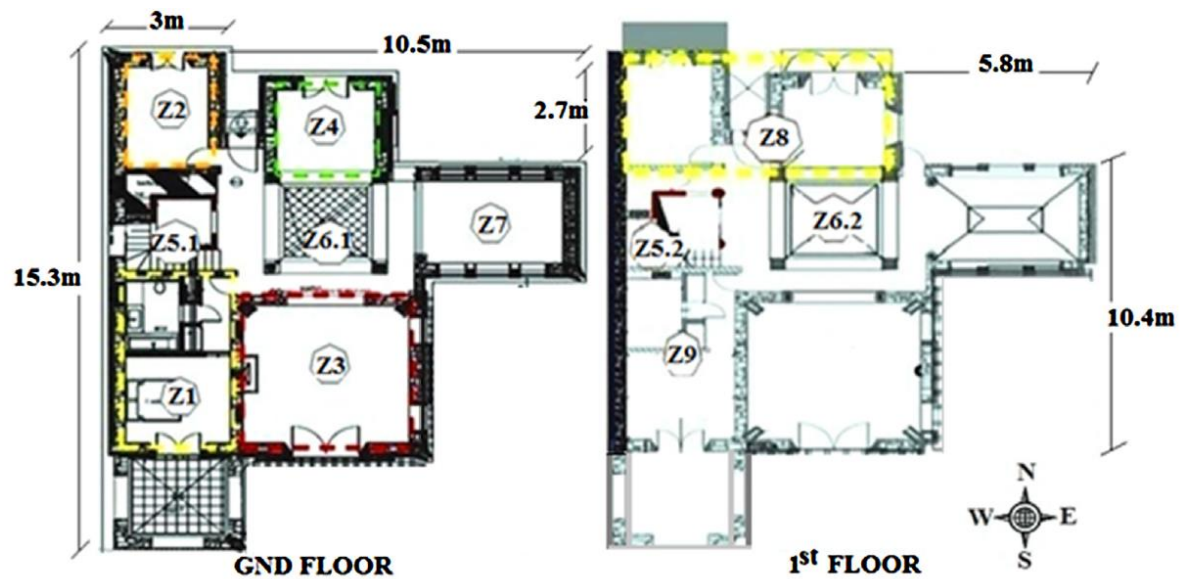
Architectural plans of the studied house. The thermal zones as defined in TRNSYS are indicated [2].
